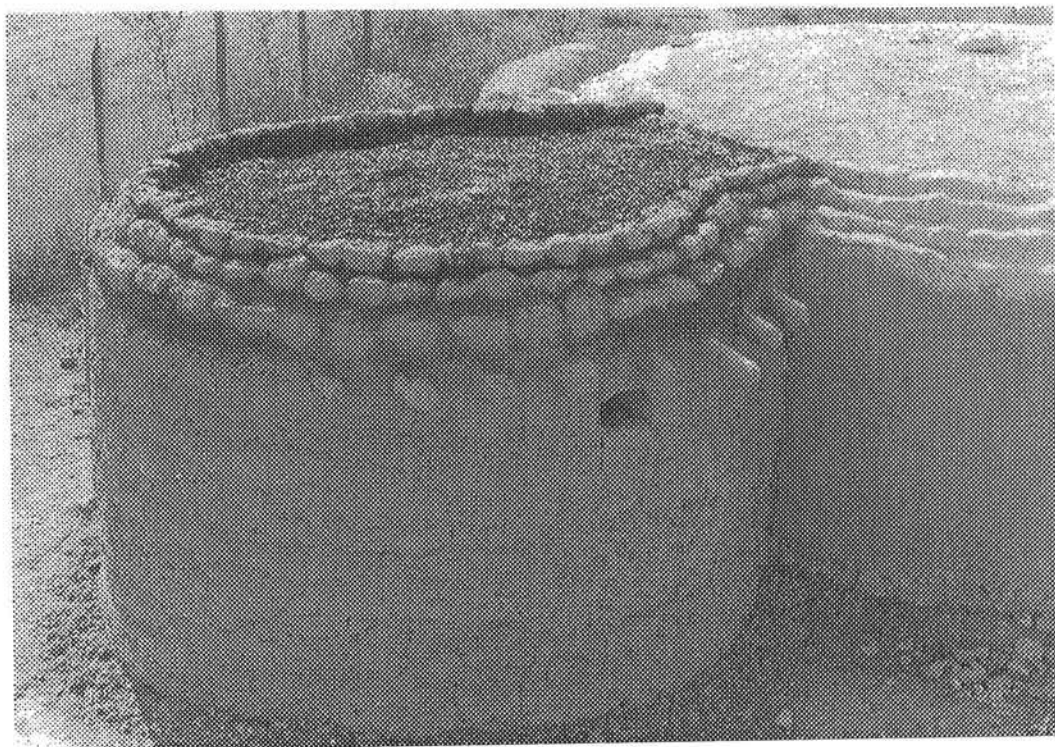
LEV, RH4 the completed building before the application of the render and the final layer of havara on the roof.
